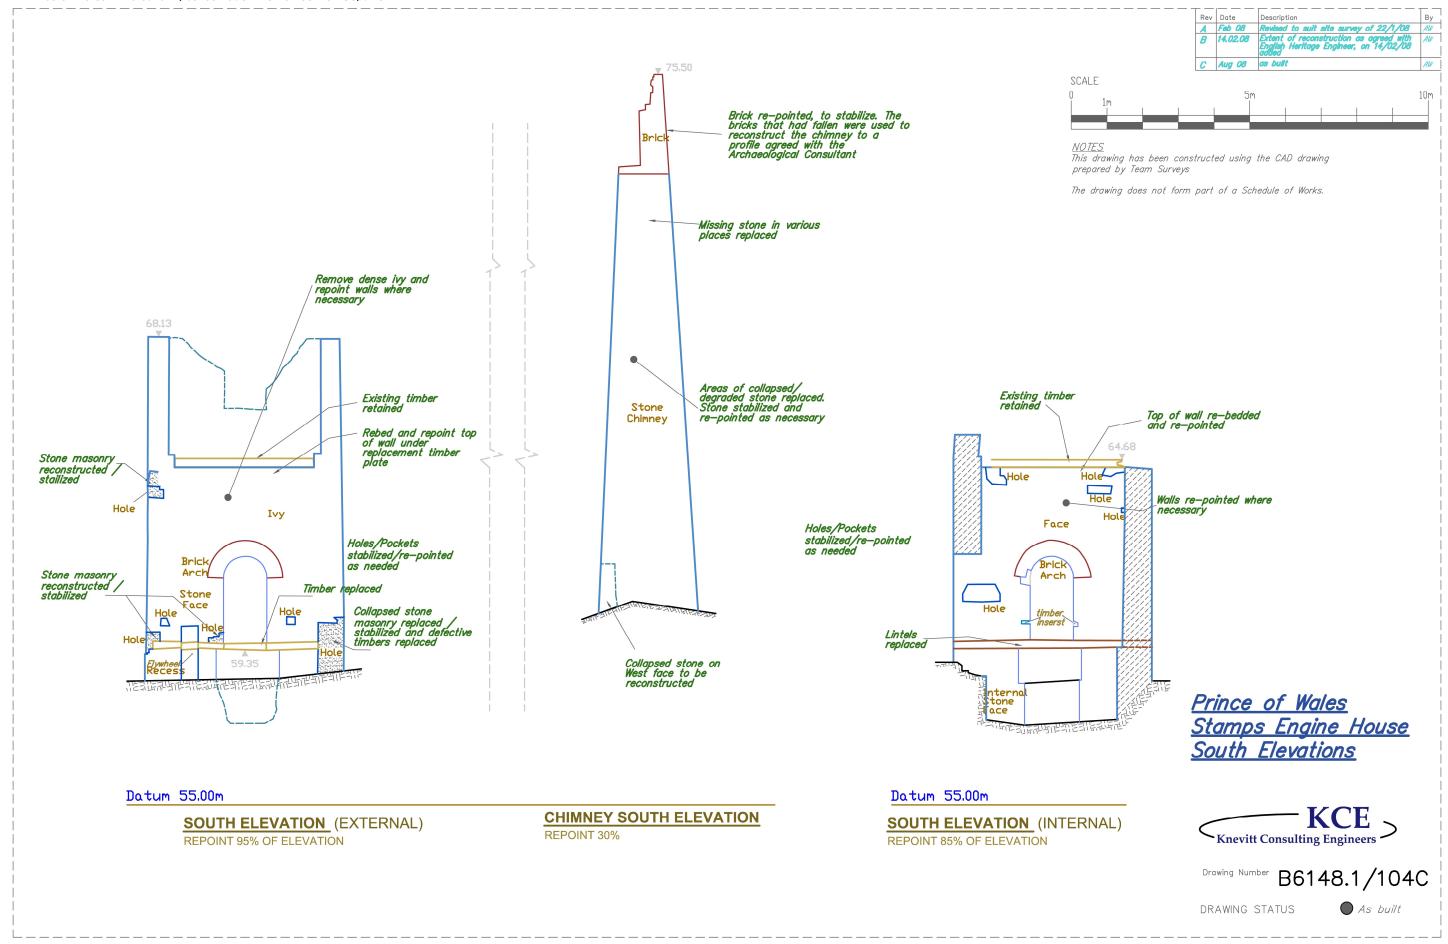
'As built' annotated South elevation surveys of the stamps engine house and chimney after works (Knevitt Cons. Engs. 2008)
